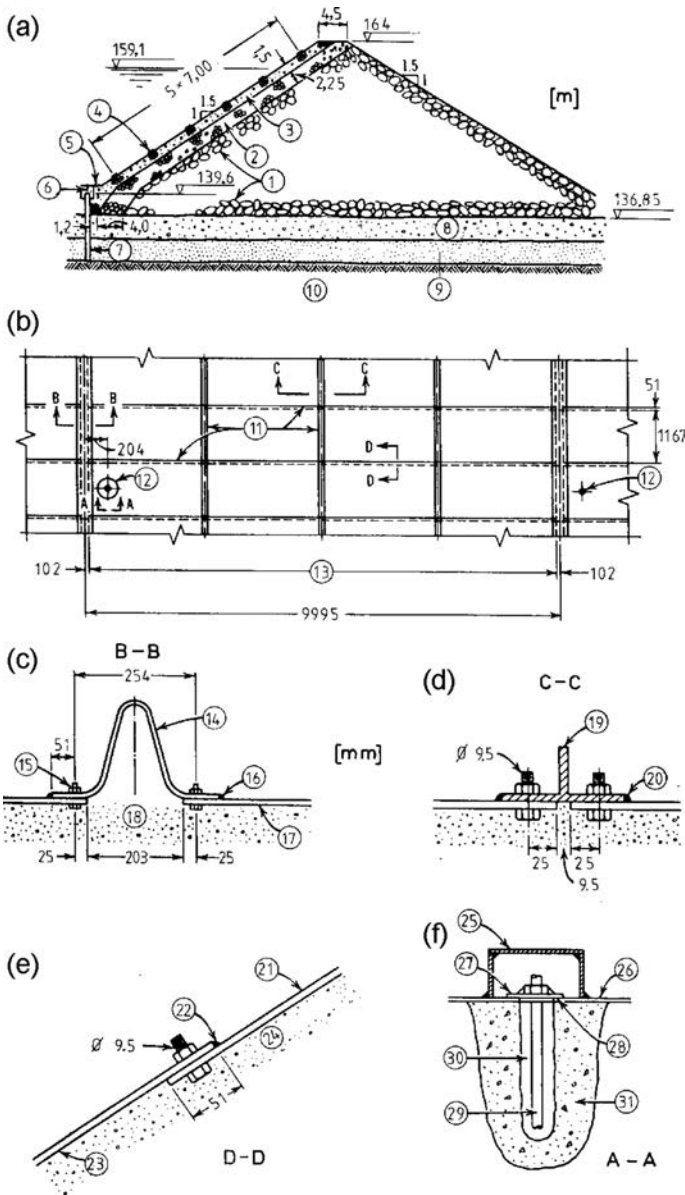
Lagartijo dam (Venezuela) with steel facing (after Sherard et al, 1963). (a) Cross-section; (b) part of the plan of the facing; (c) expansion joint; (d) joint along the slope; (e) horizontal joint; (f) anchor. (1) Dam's body of coarse and clean rockfill; (2) well-graded and compacted rockfill; (3) compacted gravel and stone chippings; (4) plate of 6.35 mm (1/4"); (5) expansion joint; (6) steel plate; (7) concrete diaphragm wall; (8) gravel; (9) silt; (10) rock; (11) plate 1219 × 6.35 × 2438 mm; (12) anchor; (13) four plates of 2438 mm with a spacing between them of 9.5 mm; (14) plate 6.35 × 660 mm; (15) bolt of 9.5 mm; (16) continuous weld; (17) plate of 6.35 mm; (18) sand; (19) T-section of 100 mm; (20) continuous weld; (21) plate 1219 × 6.35 × 2438 mm; (22) continuous weld; (23) plate as 21; (24) sand; (25) watertight box 200 × 200 × 100 mm; (26) steel facing; (27) plate of 12.7 mm; (28) opening 41 × 82 mm; (29) anchor bolt 38 × 711 mm; (30) grouted; (31) concrete.
